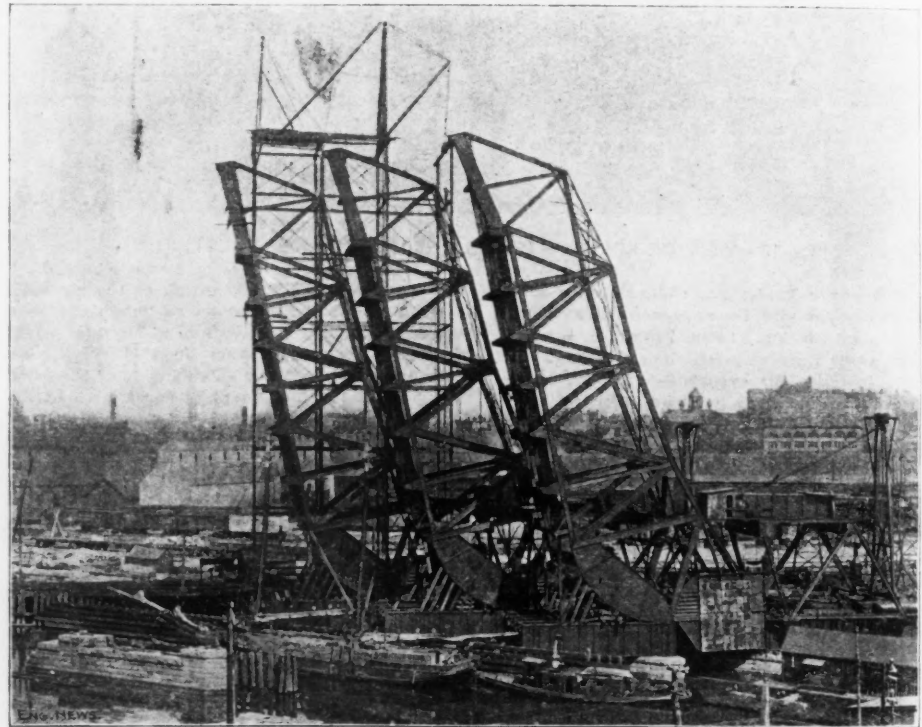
VIEW OF BRIDGE COMPLETED AND OPEN.
